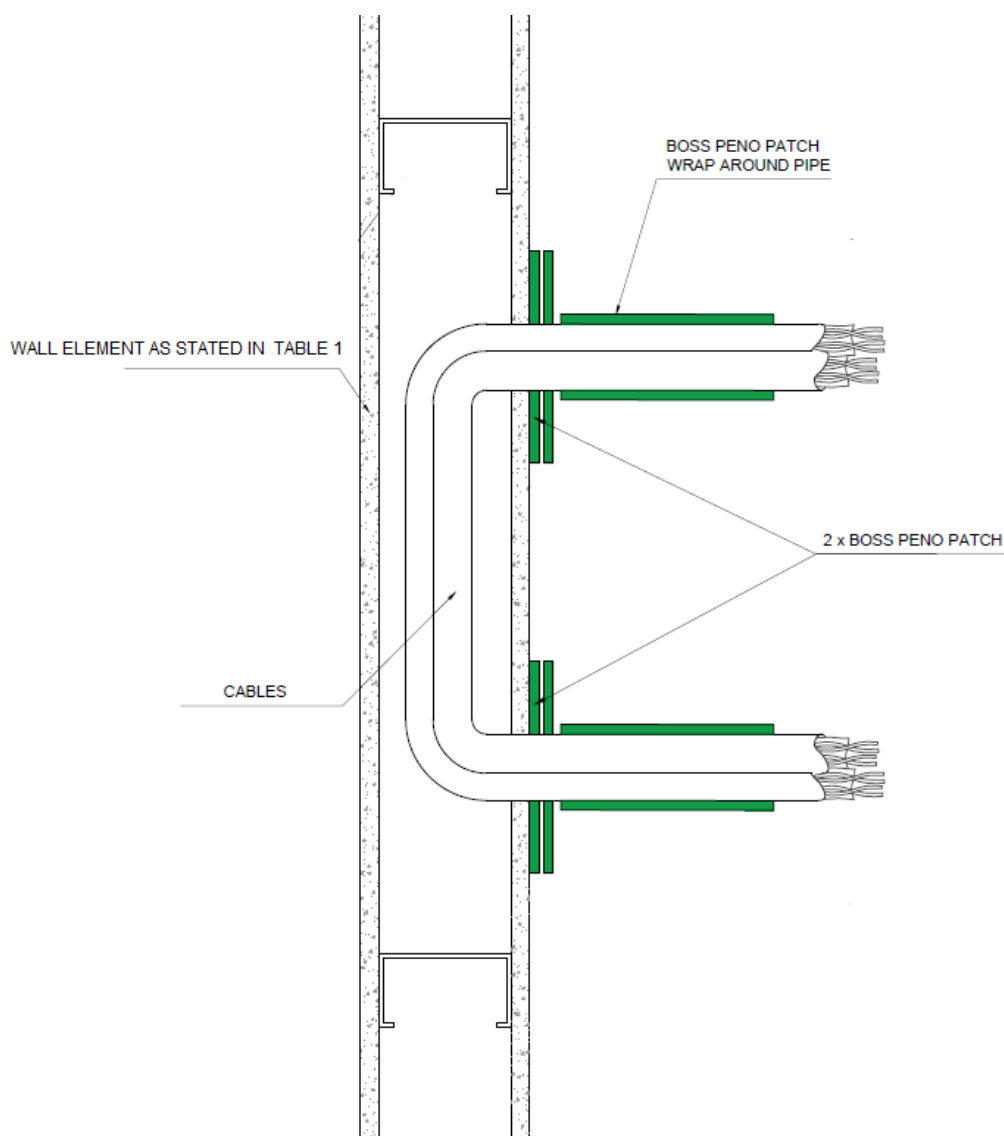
Cable penetrations penetrating the wall without exiting to the other side
